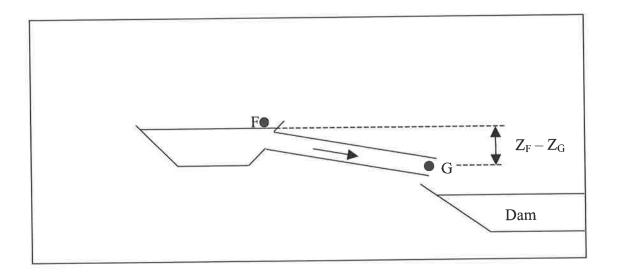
Pipe Diversion Structure (FG is the pipe length, Z_F is the elevation at F and Z_G is the elevation at G).
